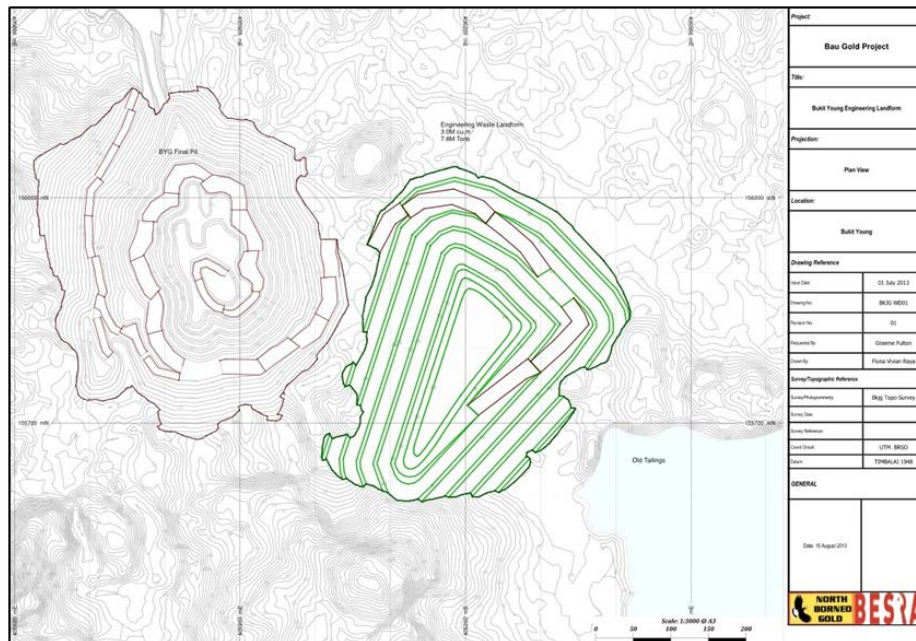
BYG-Krian: - Infrastructure Layout Plan
